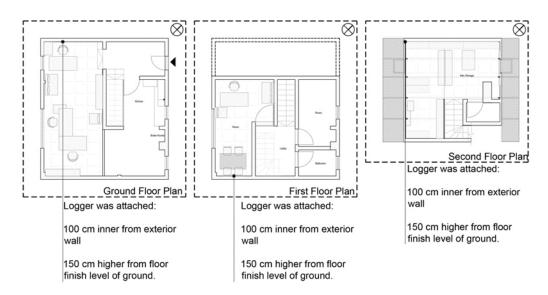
Location of data loggers and furniture layout of related rooms in building 3. The facades that measurements were taken are highlighted.
